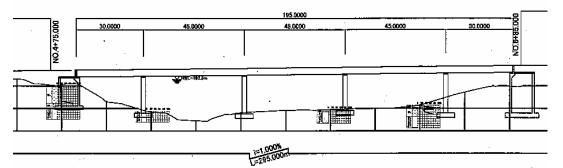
Bridge Length & Span Arrangement Plan
